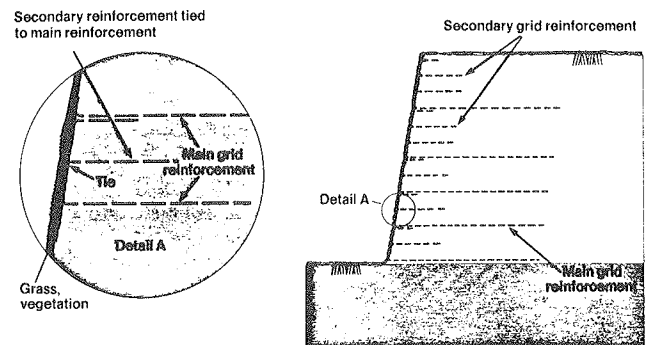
Facing provided by secondary grid reinforcement. [Netlon Ltd., 1984b]
